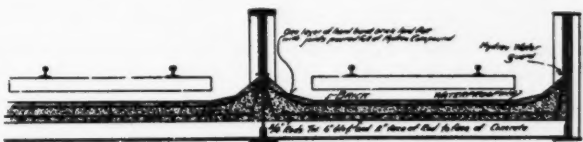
BRIGHTON BEACH IMPROVEMENT, METHOD OF WATERPROOFING BRIDGE FLOORS.
